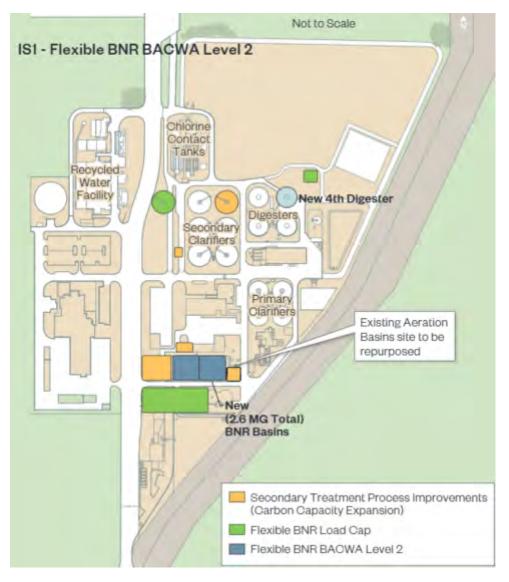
Site Layout for BACWA Level 2 (IS 1 - Flexible BNR)
